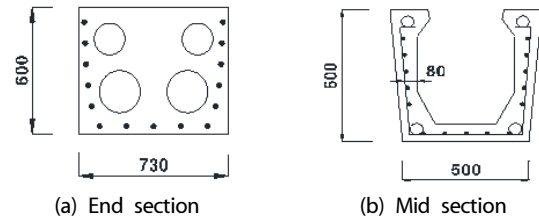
Cross section of U-shaped girder(UFS0.7 & UFS1.0)
